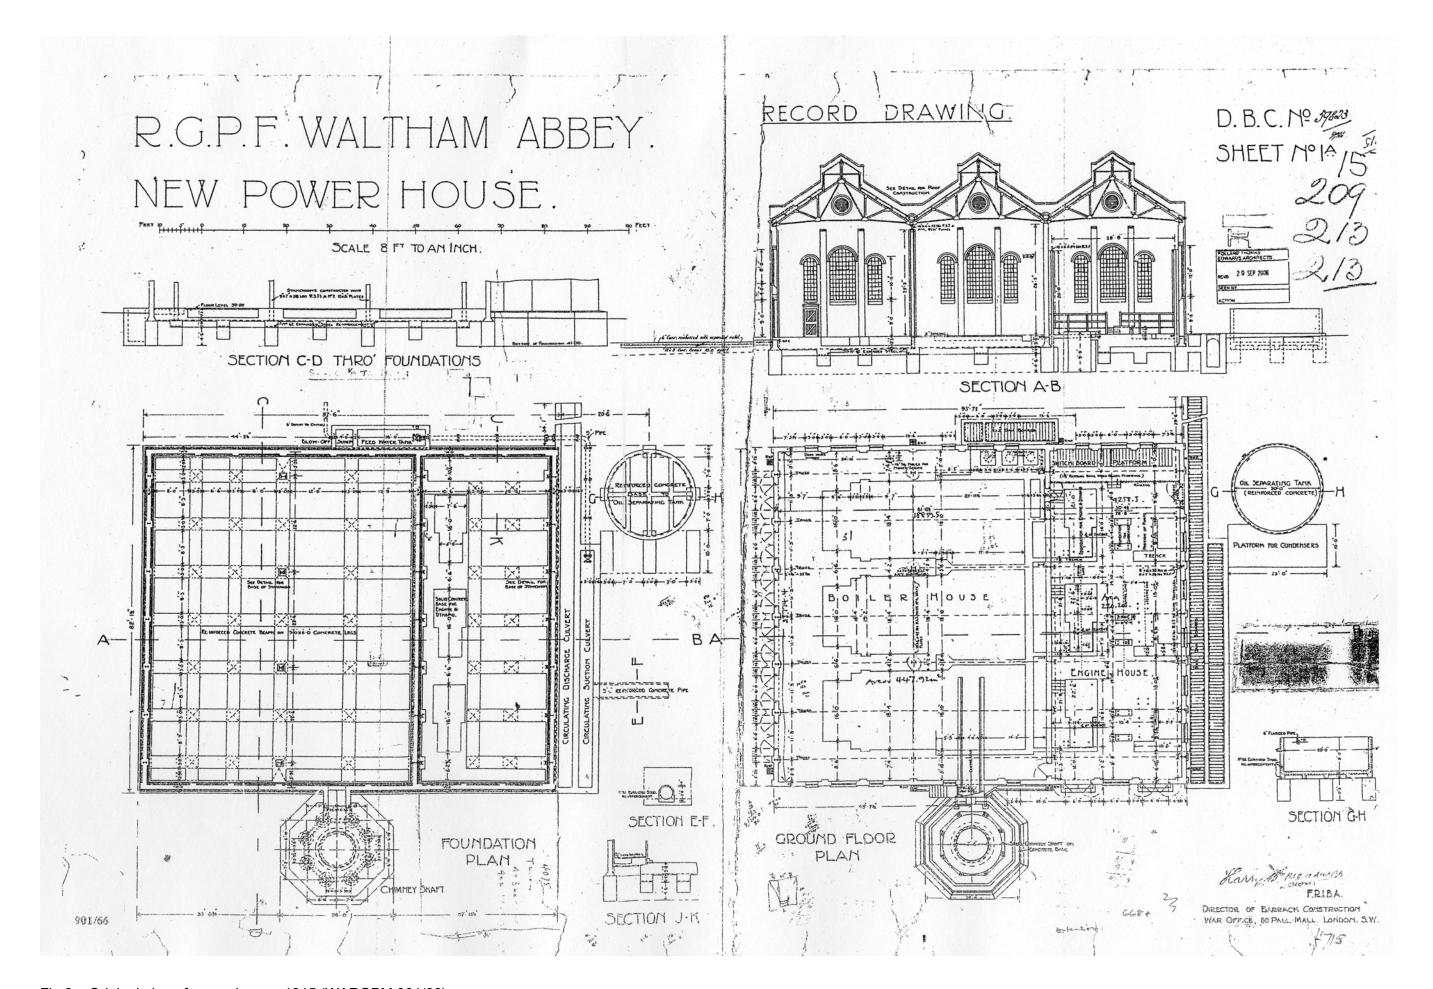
Original plan of power house, 1915 (WARGPM 901/66)
